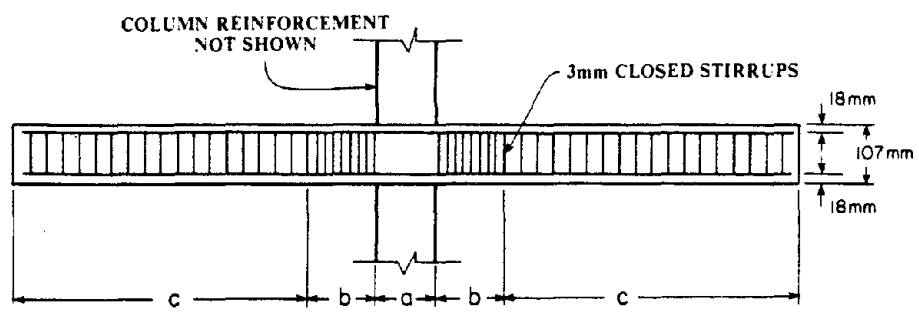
Slab Reinforcement Of Exterior Connection
